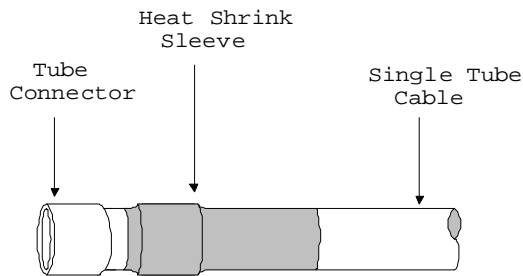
D1-1. Installed single tube BOF cable sleeve.
